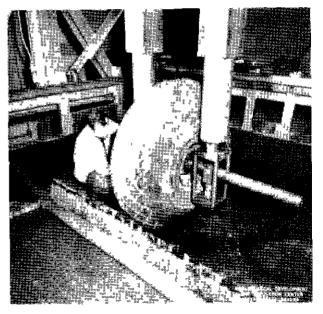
Cutaway Section of Pavement With Tire in Position for Loading
